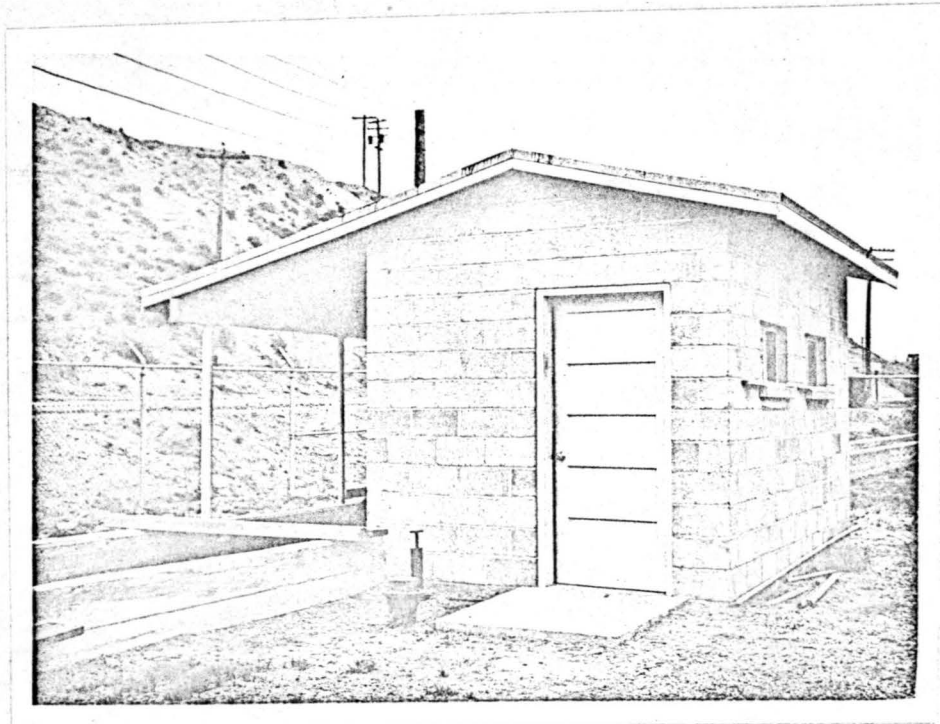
Instrument shelter house showing adjacent concrete lined supply channel. At the left corner of building note the index bar attached to roof support.
